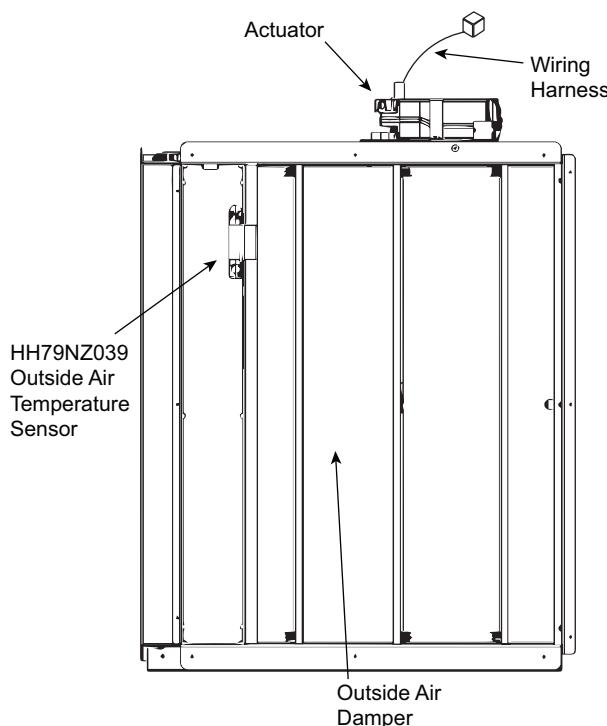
EconomizerONE Component Locations (CRECOMZR108A00 Shown)
